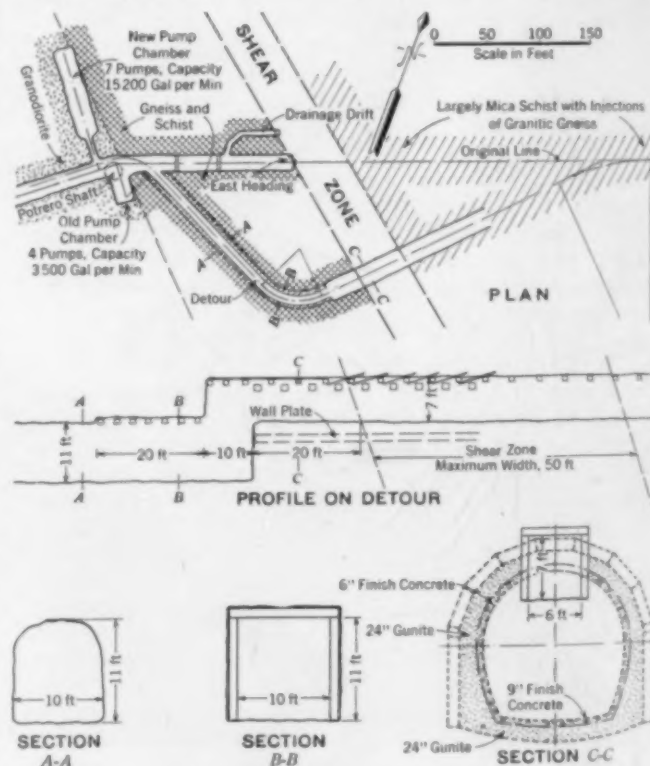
POTRERO EAST HEADING, SHOWING TUNNEL DETOUR THROUGH SHEAR ZONE
